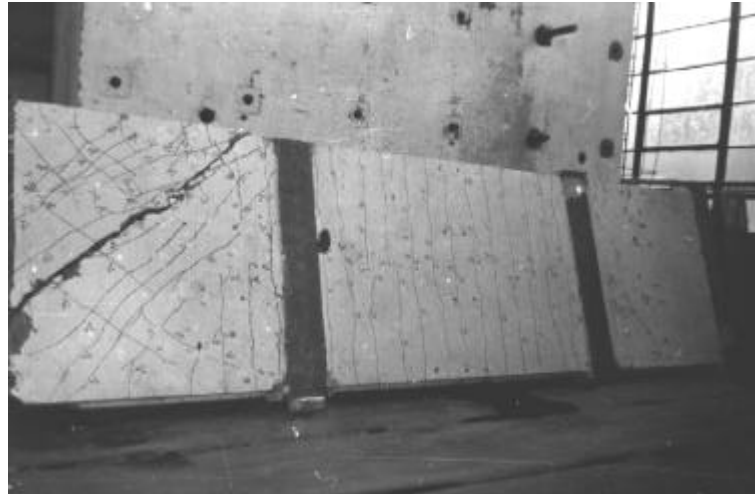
Floor crack pattern PGCUB 6.8
